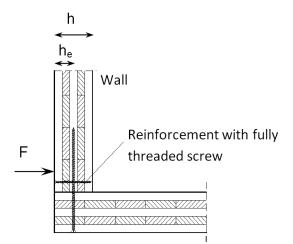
Reinforcement of connection area of cross laminated timber with fully threaded screws.
